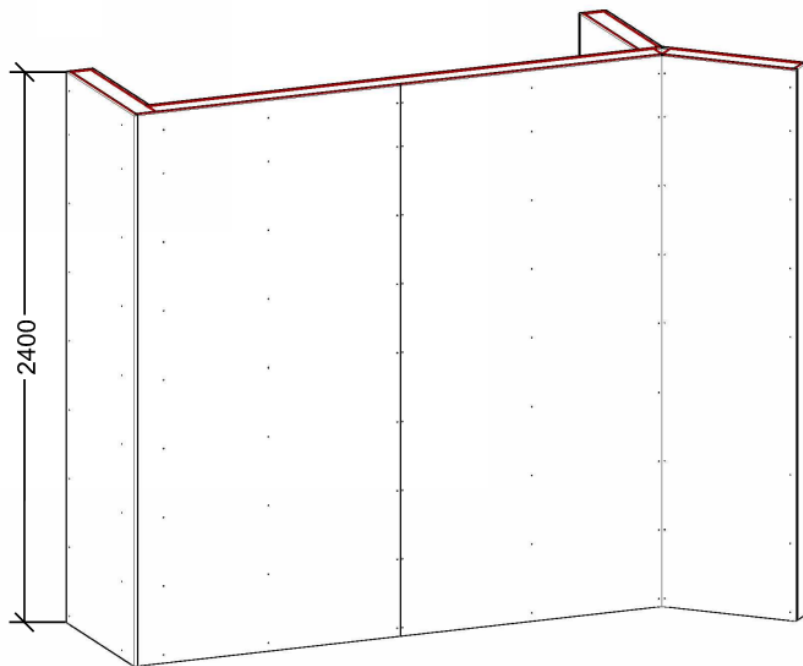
Perspective view of typical “y-shape” wall configuration for specimens tested within this study and typical specimen height to top of linings (dimensions in mm).
